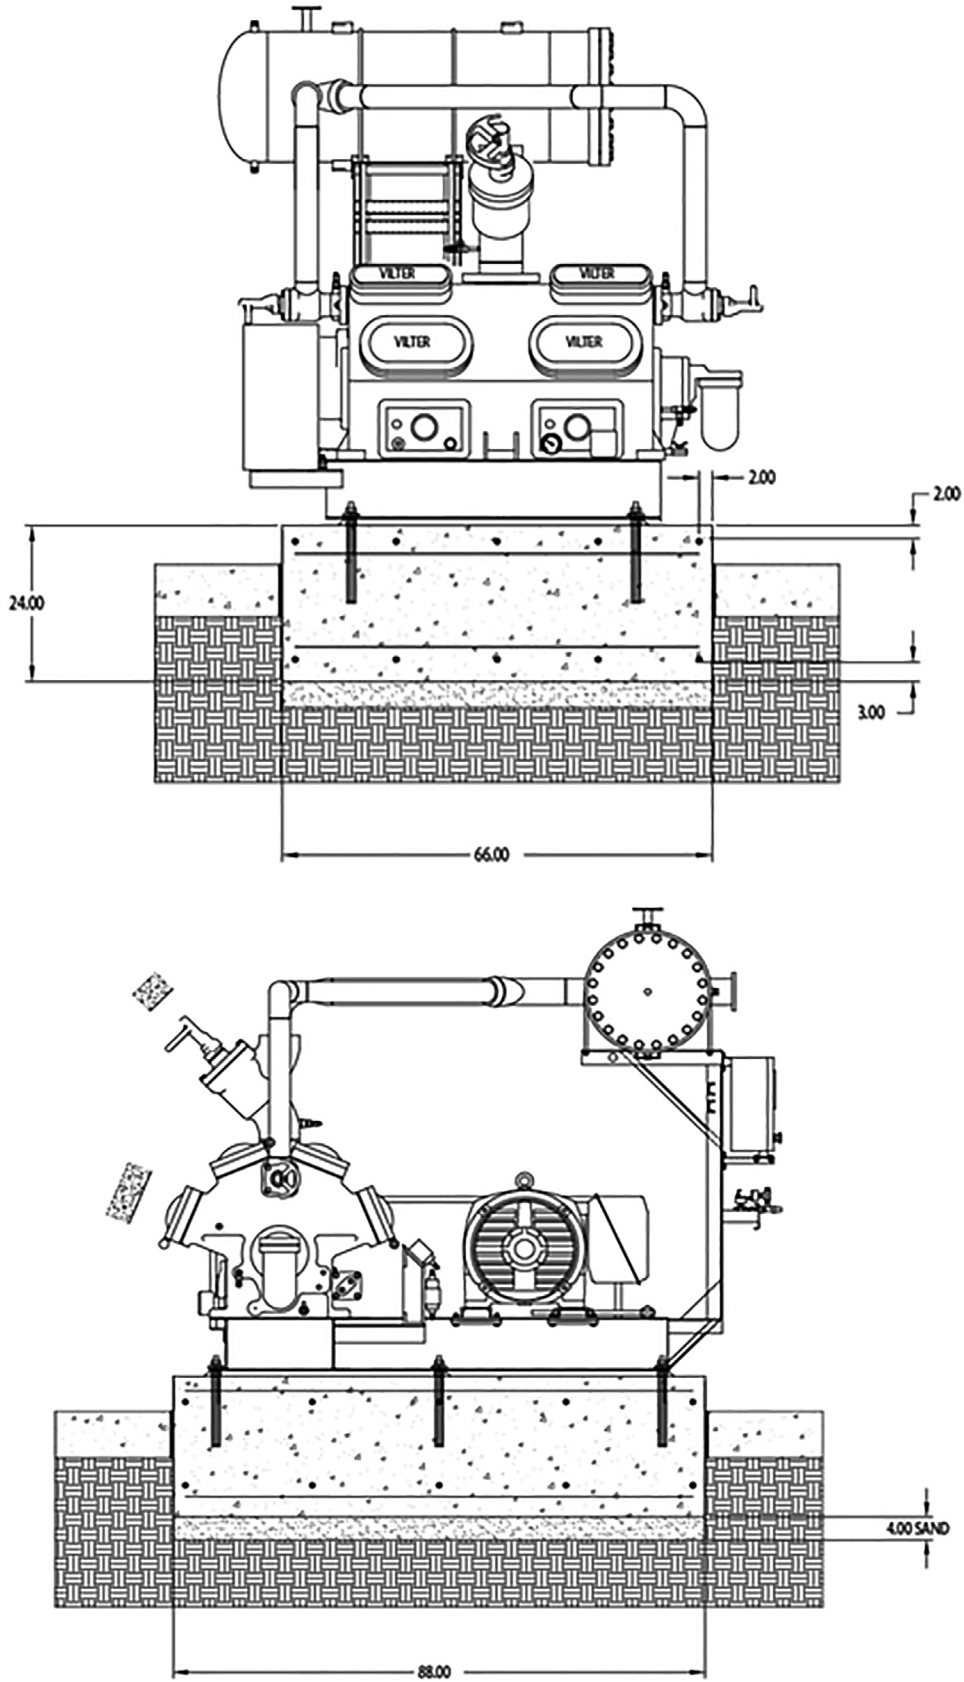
Compressor Unit and Foundation Dimensions – 12 and 16 Cylinder (5 of 6)
